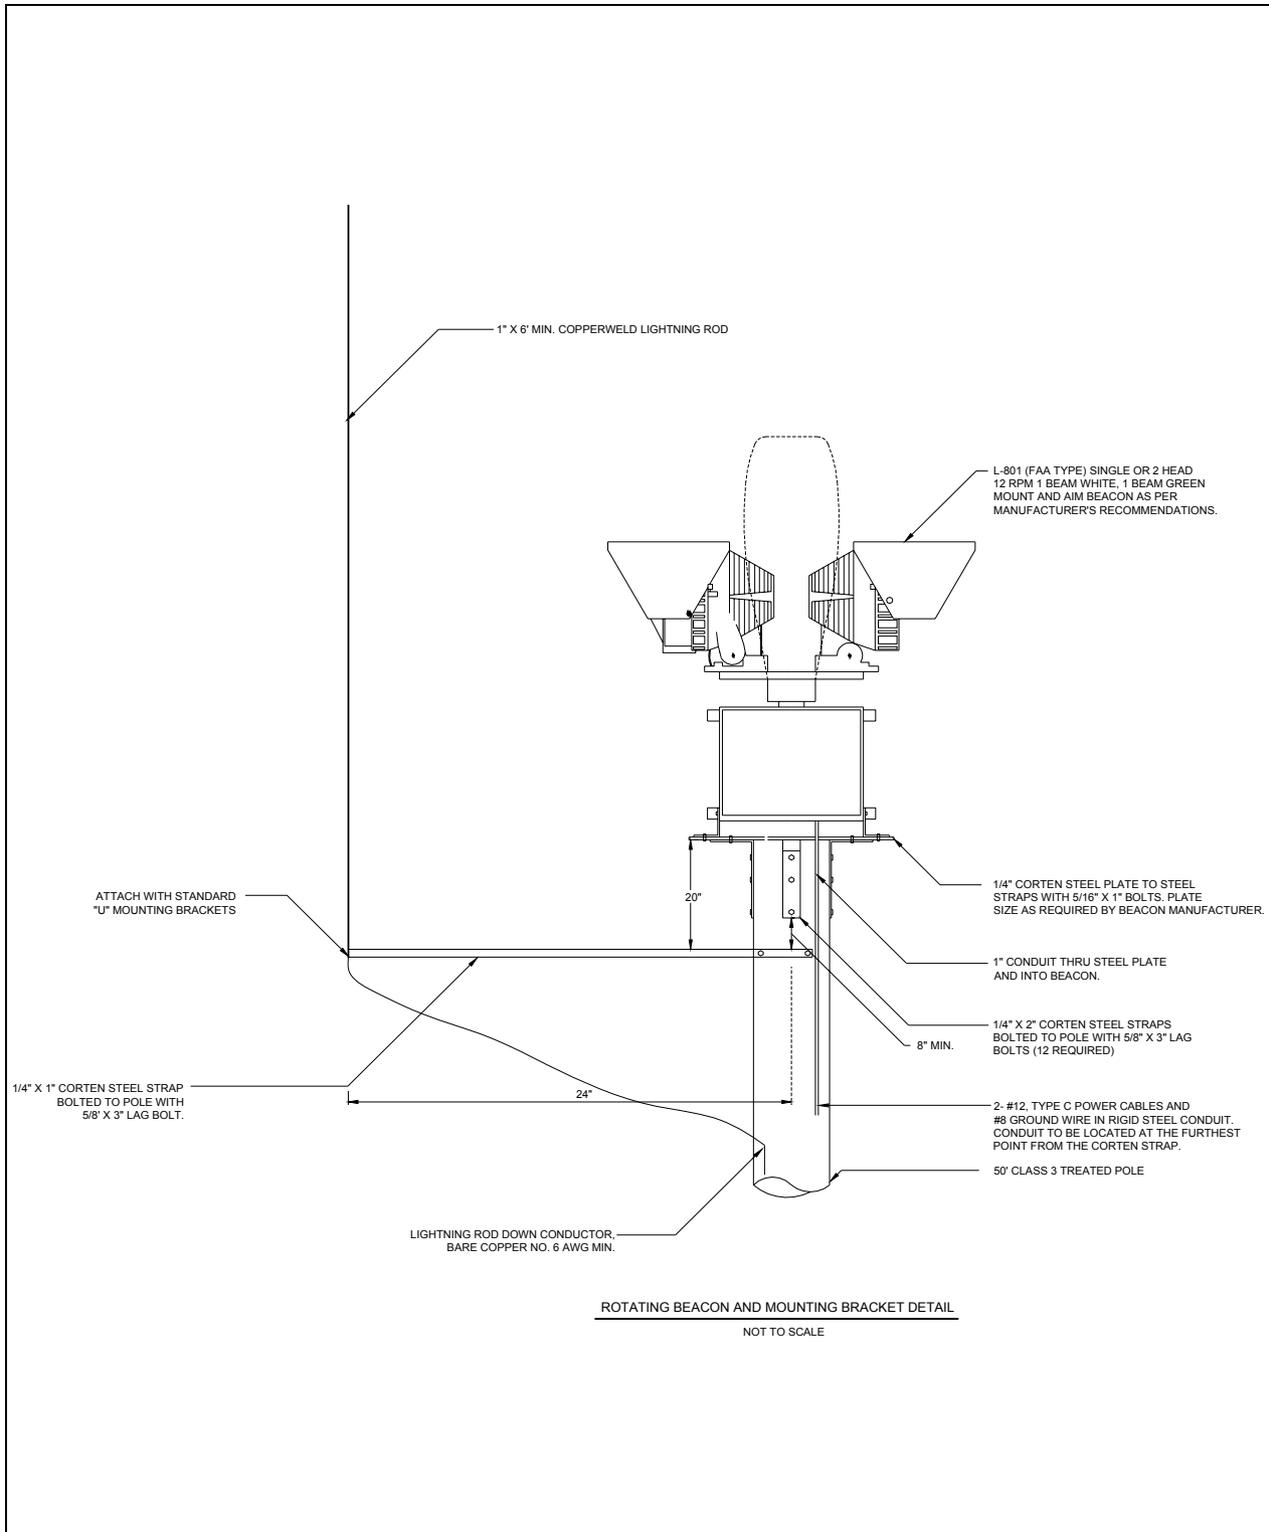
Standard Details for Pivoting Rotating Beacon Pole –Rotating Beacon & Mounting Bracket Detail
